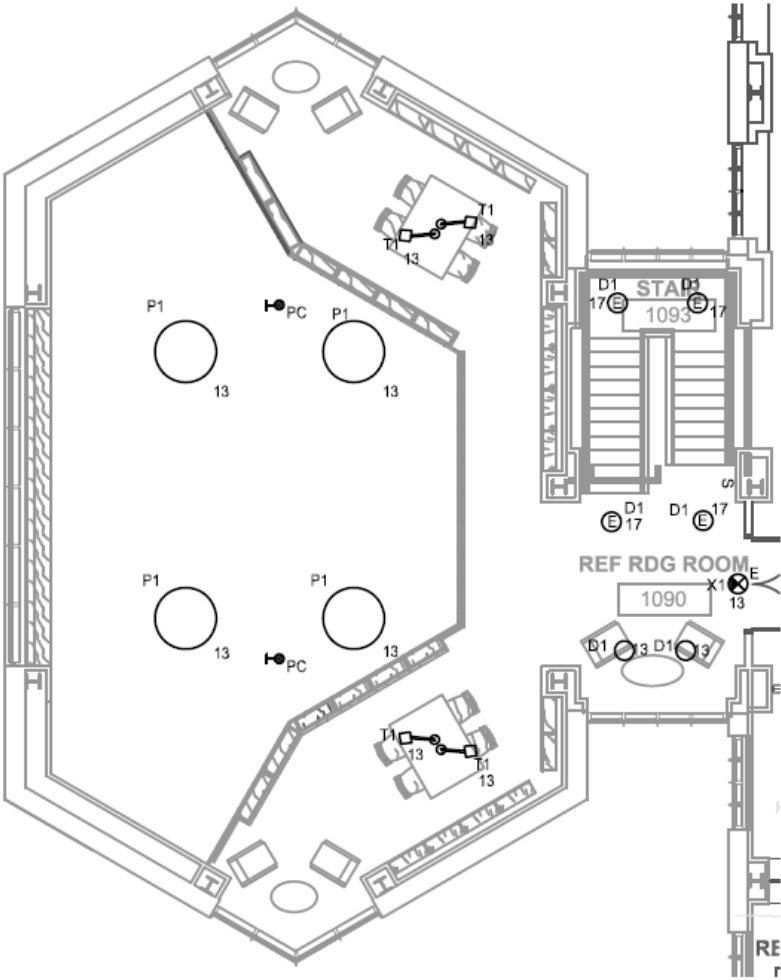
| Reference Reading Room - First Floor Lighting Plan
